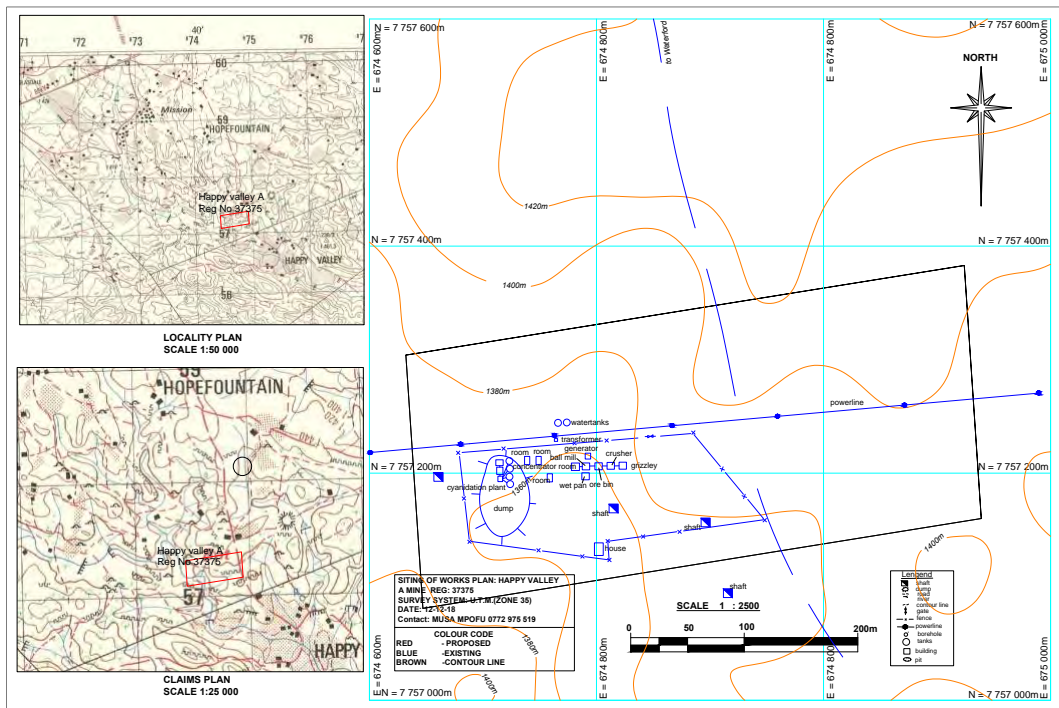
Siting of Works Plan approved by the Ministry of Mines.
